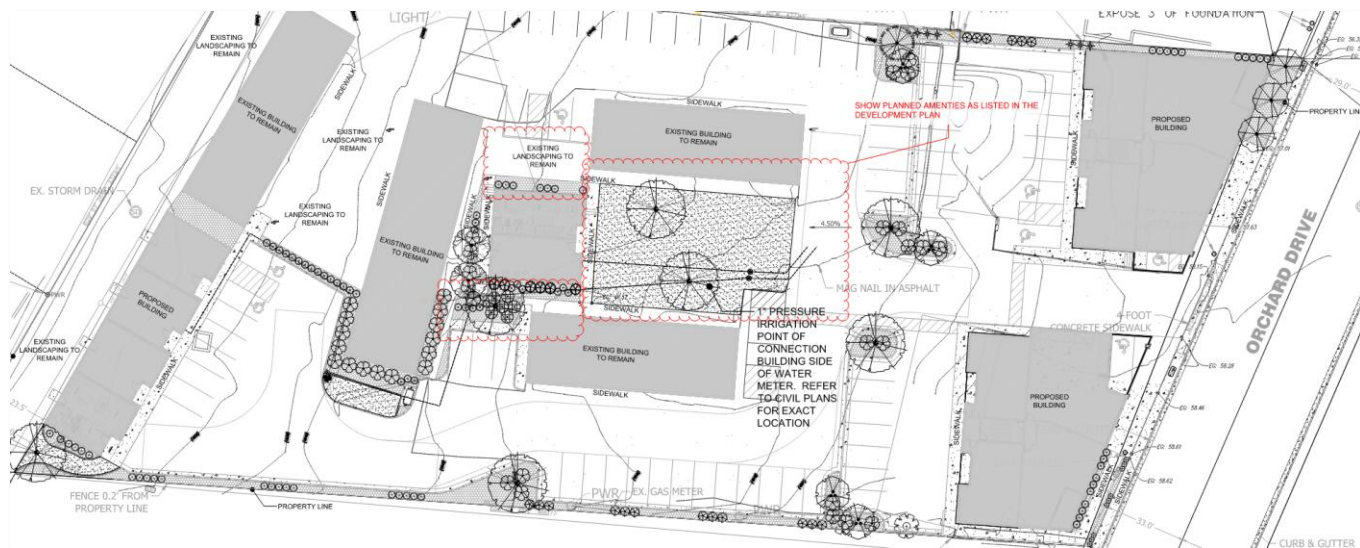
Hidden Gardens Landscape Plan, Sheet L-1
